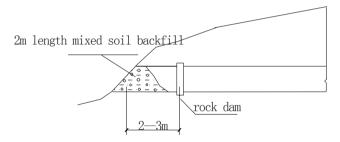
Sealing cross-section of adits and inclined shaft without drainage.
